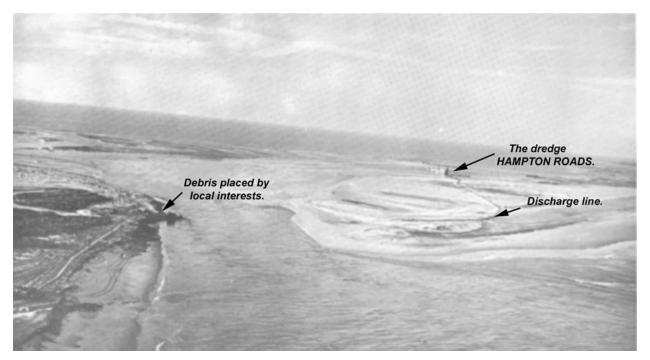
The Buxton breach, 29 January 1963, looking toward sound (Wilmington District 1963)
